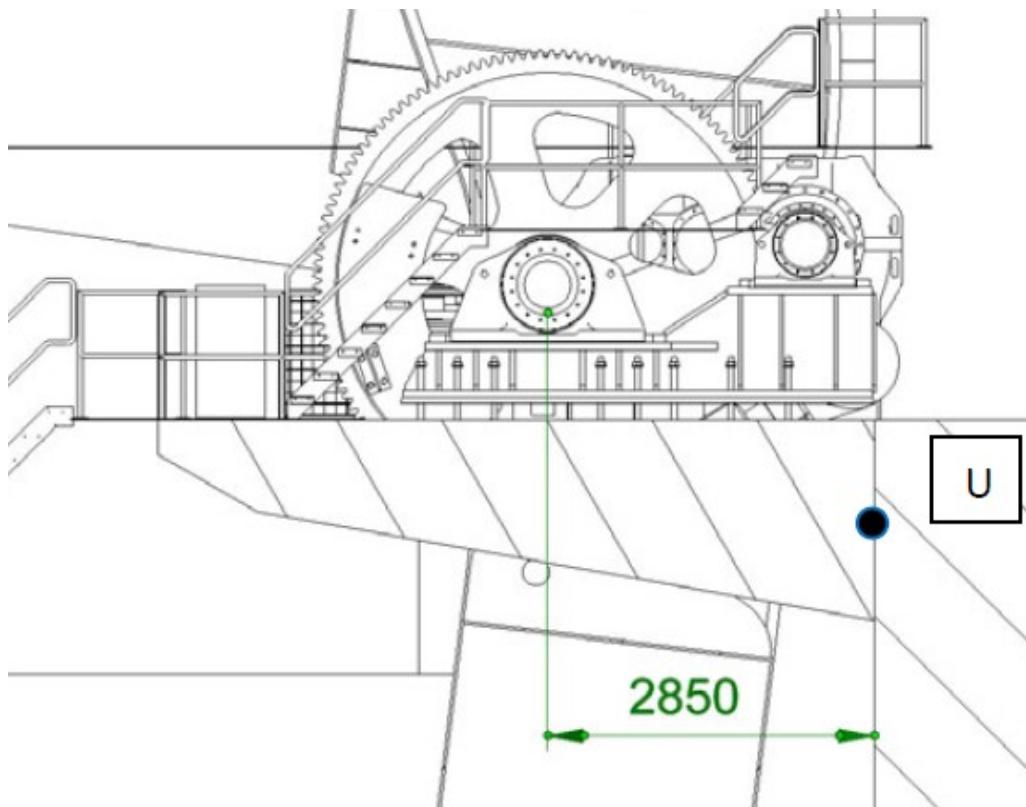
Sectional view highlighting the panama wheel construction of the Current Amalia-bridge (Heijmans, 2015)
